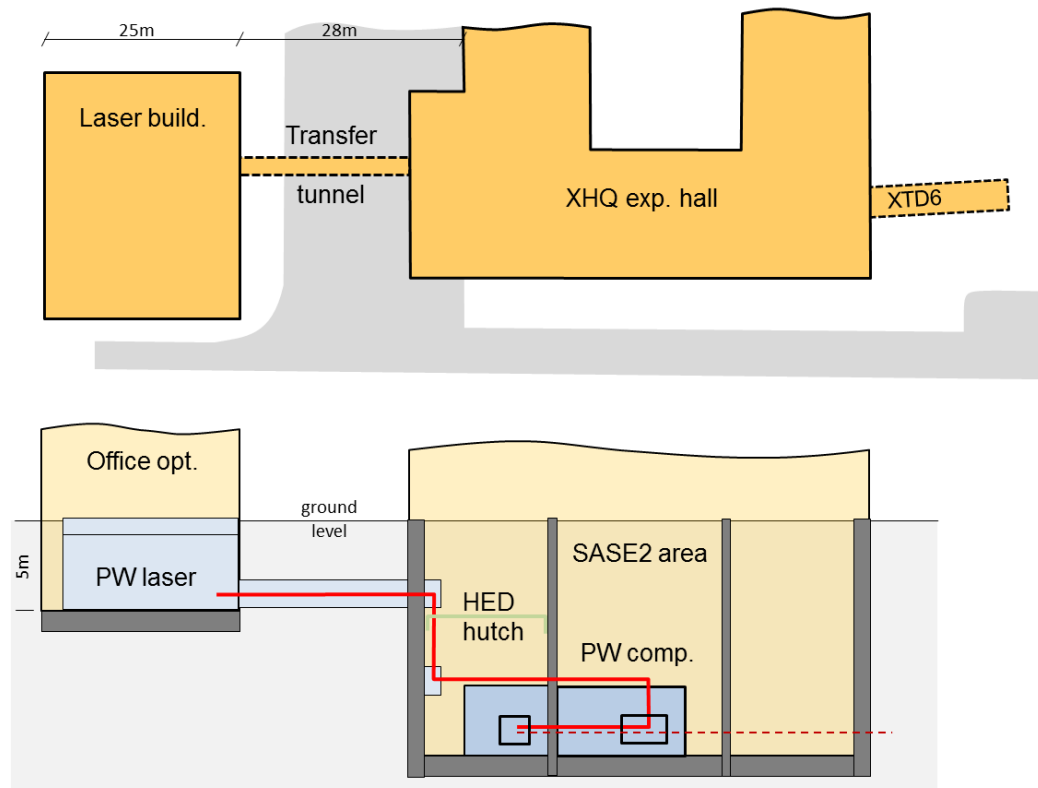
Foot-print and cross-section of the SASE2 area of the XHQ hall and the proposed laser building.
